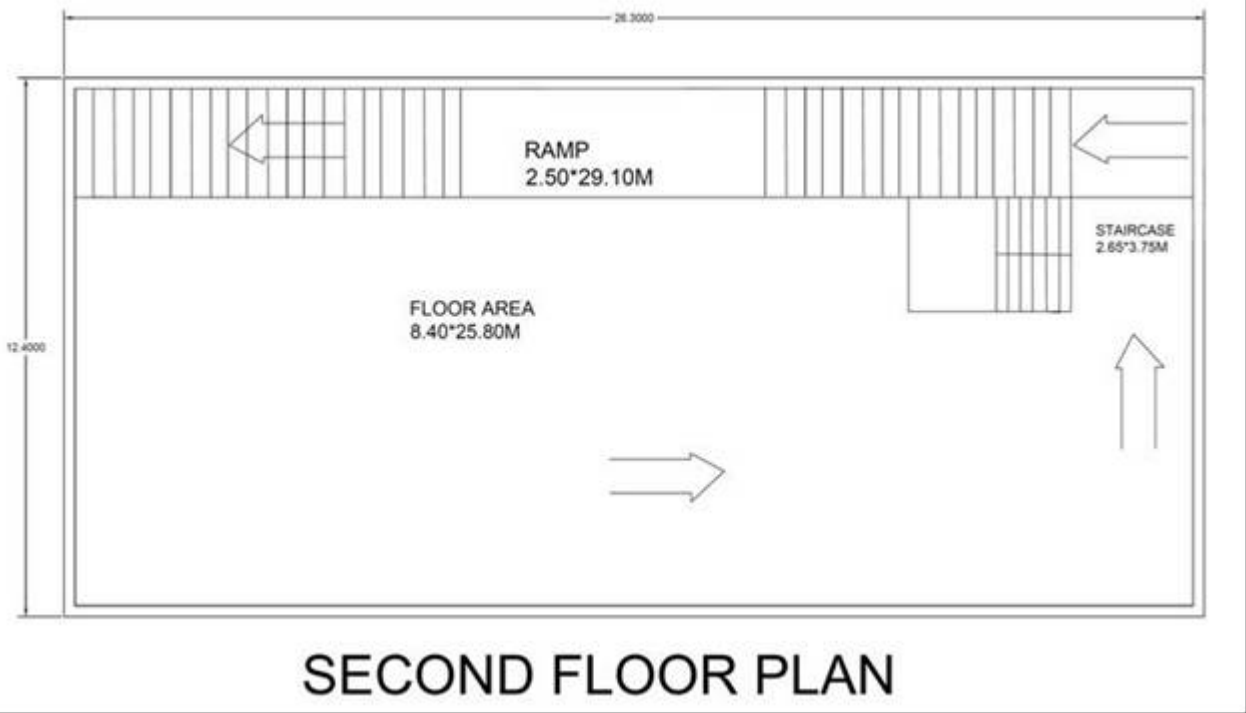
Parking Location: Second Floor Plan, Rajpayga Multi Level Parking
